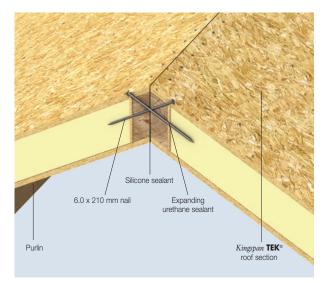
Fixing of Roof Sections at the Ridge with no Ridge Beam
